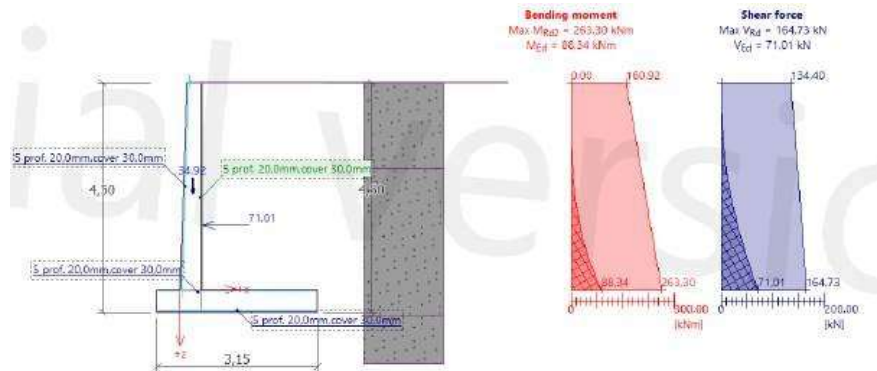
GEO5 cantilever wall reinforcement, bending moment, and shear force calculations
